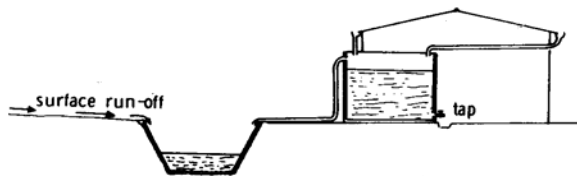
Rainwater catchment from roof and ground surface. Adequate precautions can prevent droppings, dust and debris from being washed off the roof into the tank; the roof tank is potential drinking water source while the excavated tank can provide wash or garden water [7, 286].
